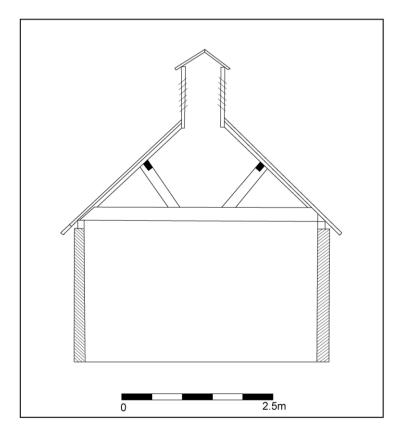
Section showing open truss roof construction in N extension to Barn 2
